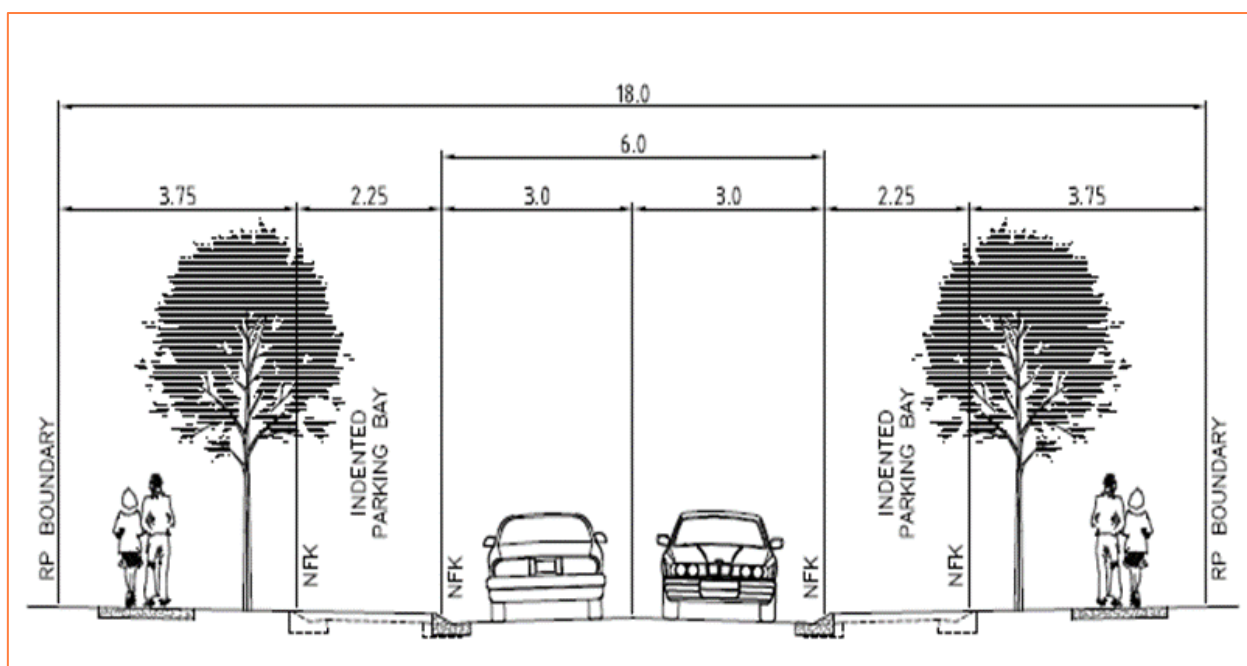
Council Typical Example – Neighbourhood Road (City Plan – BSD1021)
